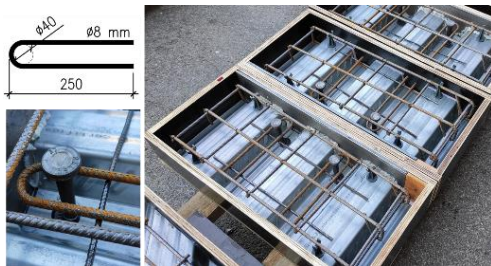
U-bar geometry and specimens with stirrups before concrete casting
